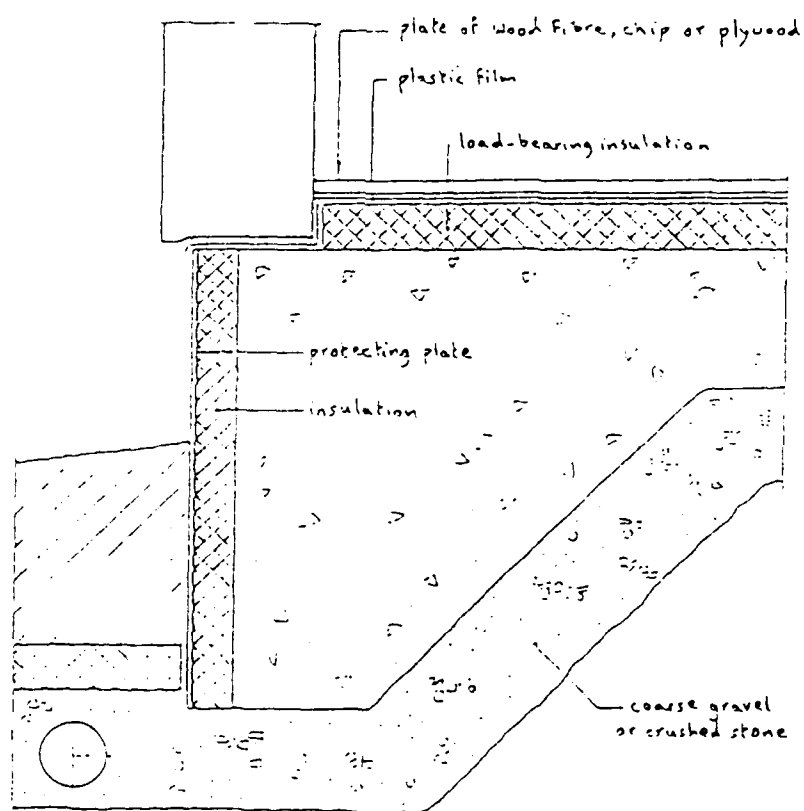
Example of 'slab-on-grade' with edge-expanded concrete slab. Such a slab gives more load spread with poor foundation conditions.
